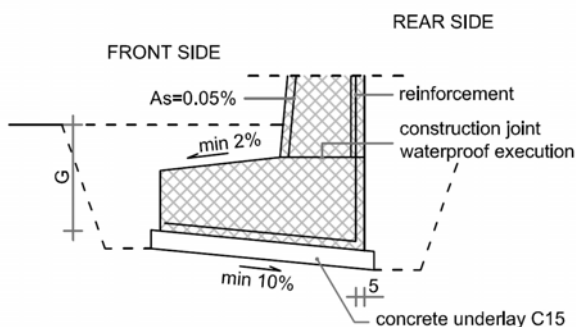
Detail of reinforced concrete gravity wall foundation
